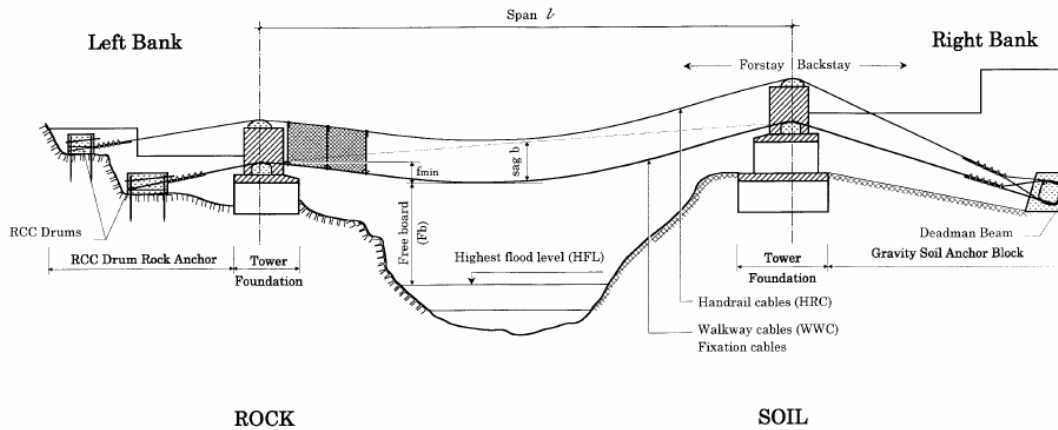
Typical profile for Helvetas pedestrian suspended bridge (Helvetas/TBSP 2003a)
